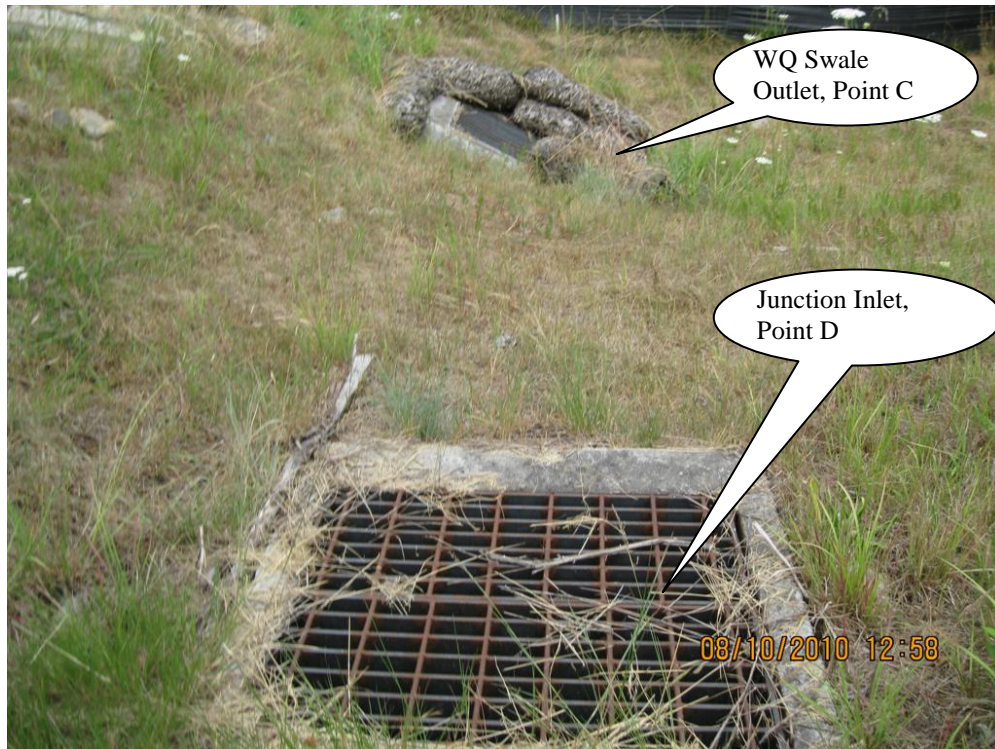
Junction Inlet in the foreground. Swale outlet ditch inlet in the background.
